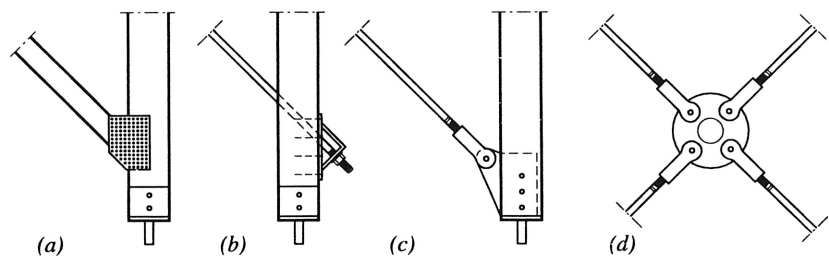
Different details of diagonal bracing, (a) timber diagonal with nailed steel plate, (b) steel rod with simple end connection, (c), (d) steel rod with cast-iron connectors.
